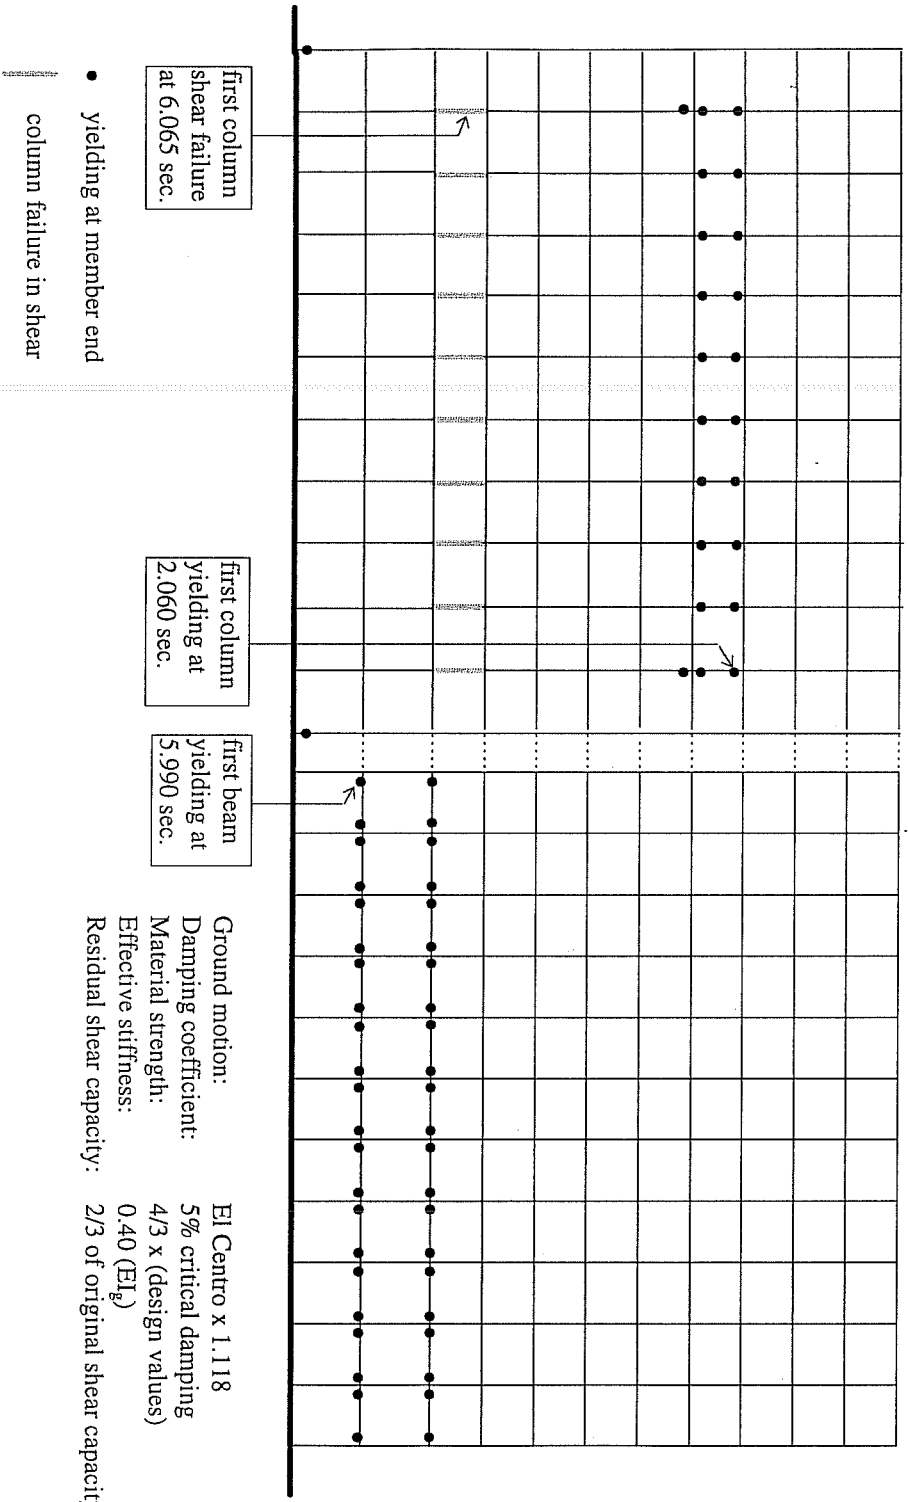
Failure State of the Ten-Story Building Subjected to 1940 Imperial Valley Earthquake
